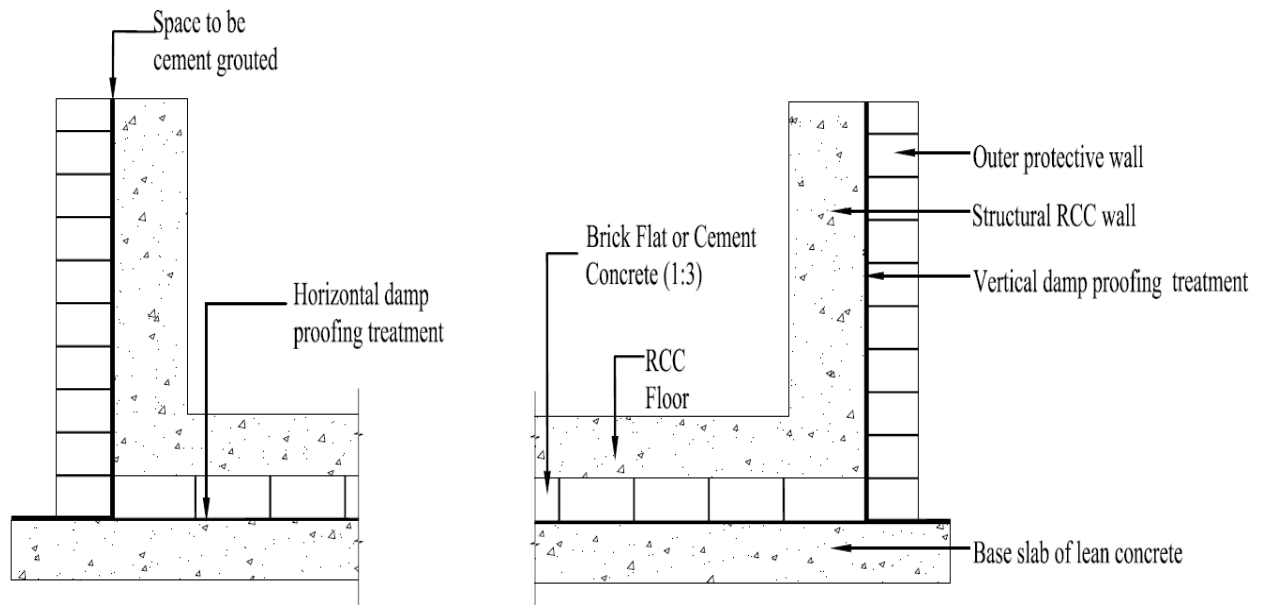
Typical damp-proof treatment for basement in new buildings under construction
